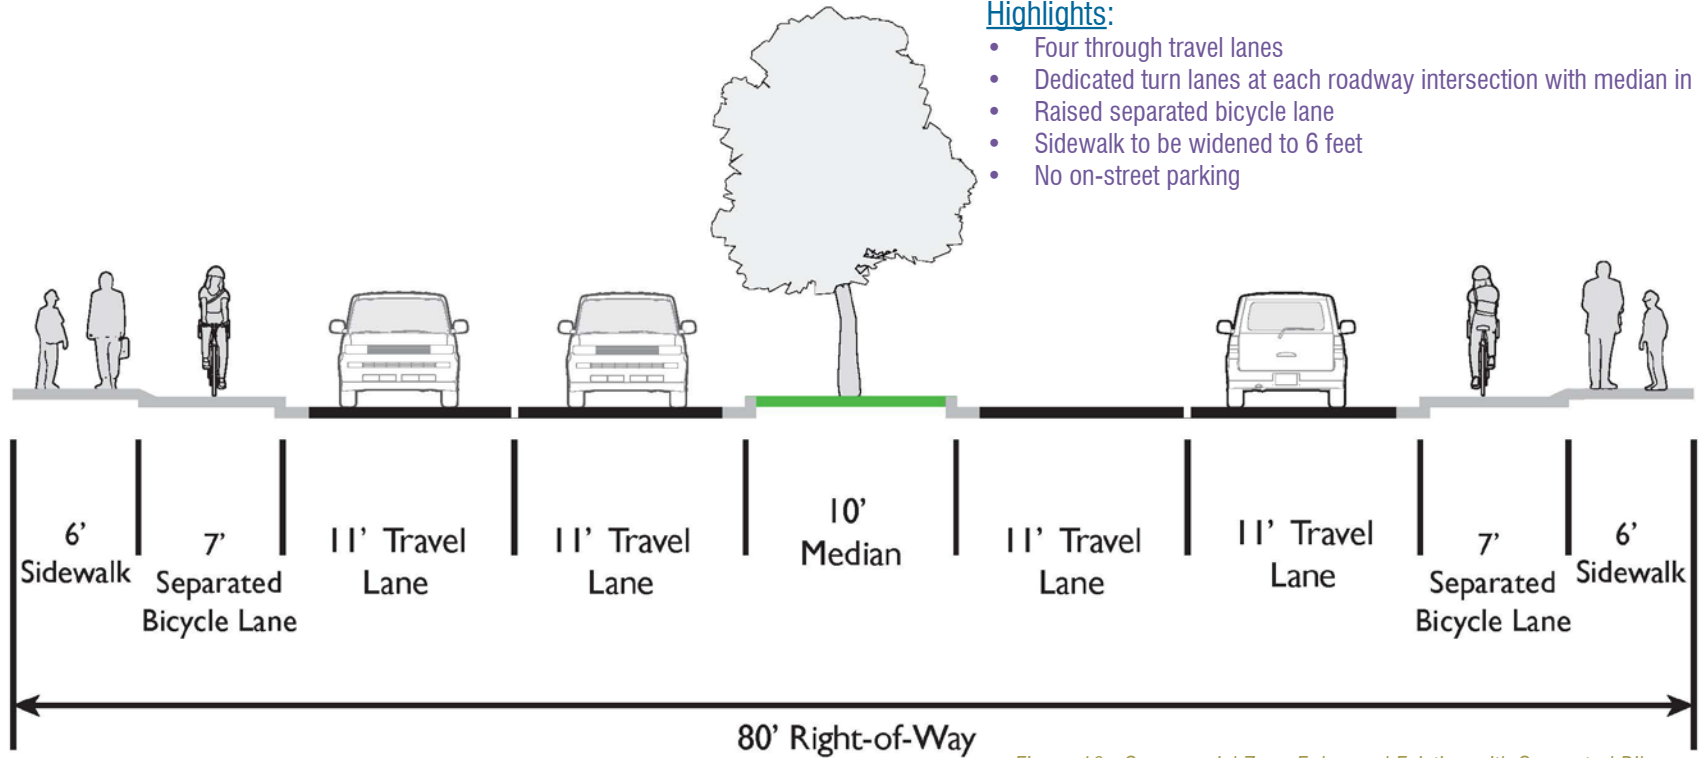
Commercial Zone Enhanced Existing with Separated Bikeway - Section
